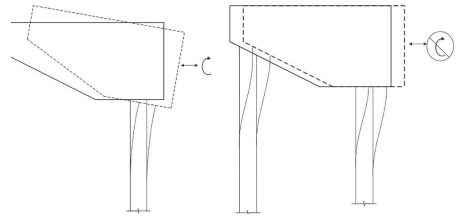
Movement and rotation of an FIAB with cantilevered U-wingwalls with and without piles beneath the wingwall
